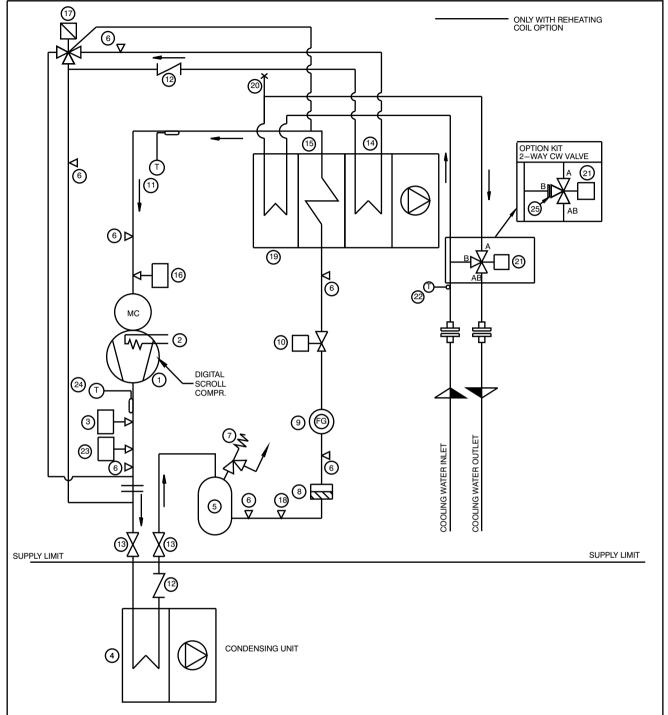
Refrigerant circuit D version - Single circuit - Single DIGITAL SCROLL compressor - TXV
